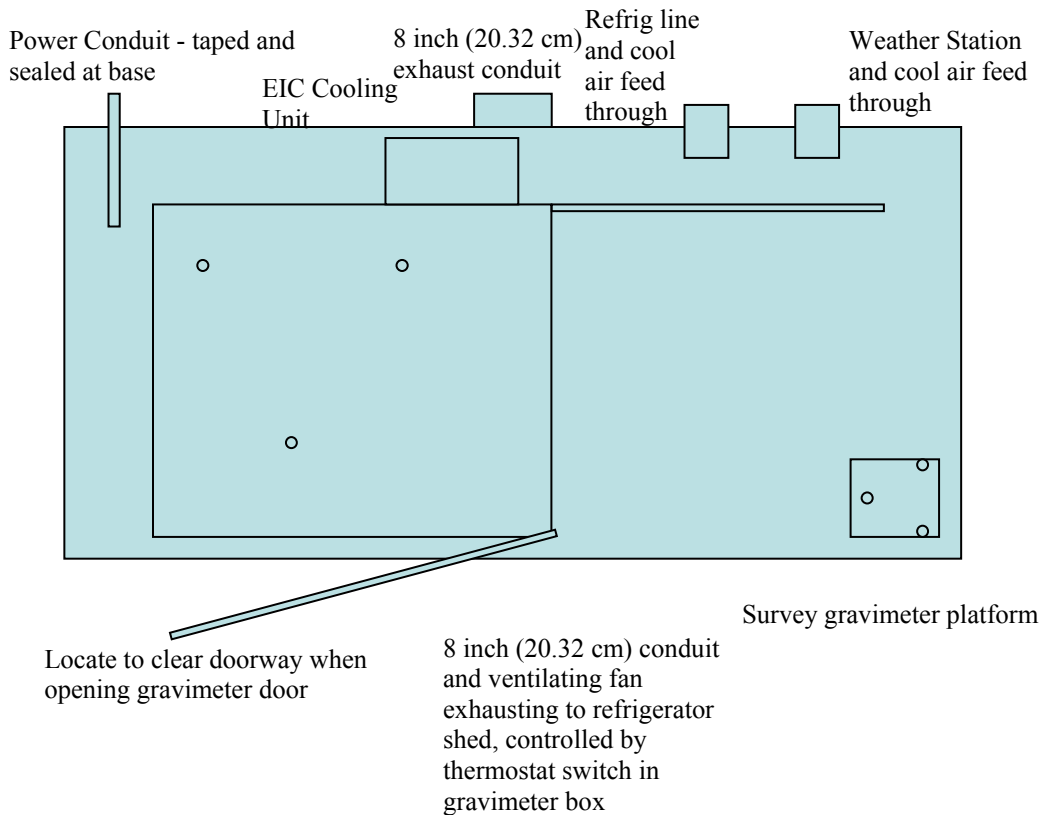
Gravimeter shed (S1) layout at site of Green Emerald Terrace. Gravimeter box and shed are drawn in same scale. The shed is a Rubbermaid 3.5'x7' (1m x 2.1m) mounted on 4'x8' (1.2m x 2.4m) plywood deck. There are two holes on side panel for refrigerating hoses and weather station cables to go through, and one exhaust conduit on gable to refrigerator shed. The power conduit at left bottom is used to pass power from refrigerator shed.
